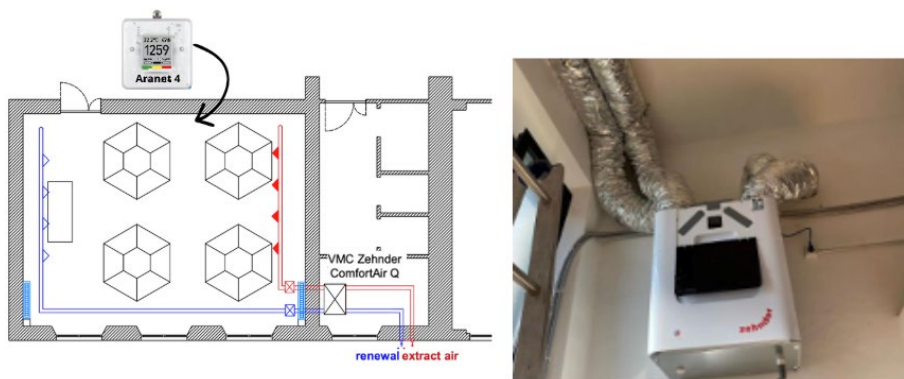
Floor plan and monitoring setup for the Nereto classroom.
